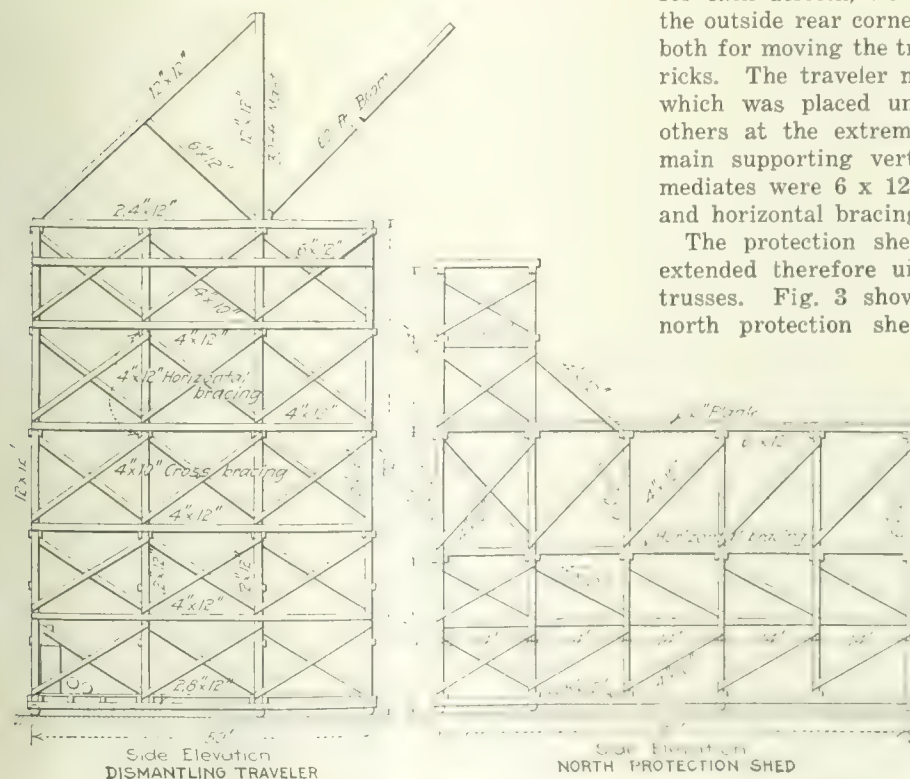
LONGITUDINAL SECTIONS OF DISMANTLING TRAVELER AND PROTECTION SHEDS
